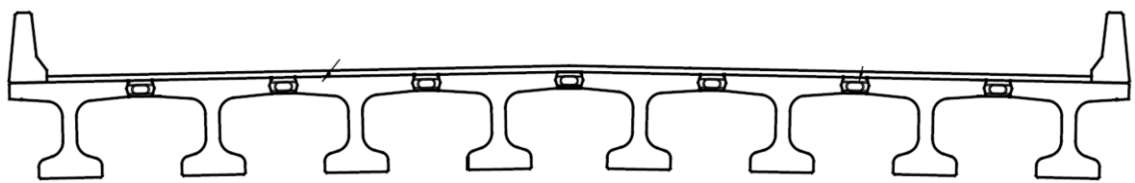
Typical Decked Bulb Tee girder bridge cross-section (PCI Northeast)
